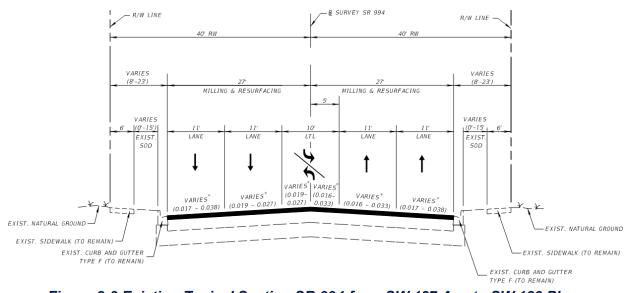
Existing Typical Section SR-994 from SW 127 Ave to SW 123 Place
